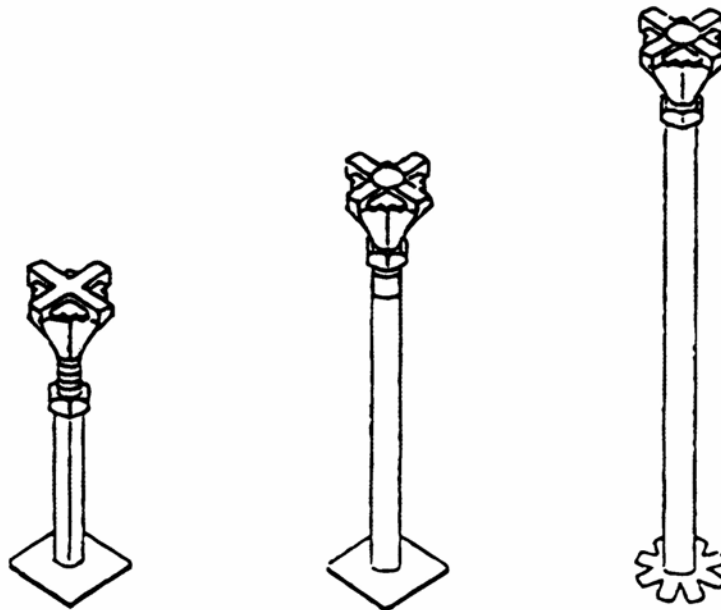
TYPICAL SECTION OF RAISED FLOOR SYSTEM
